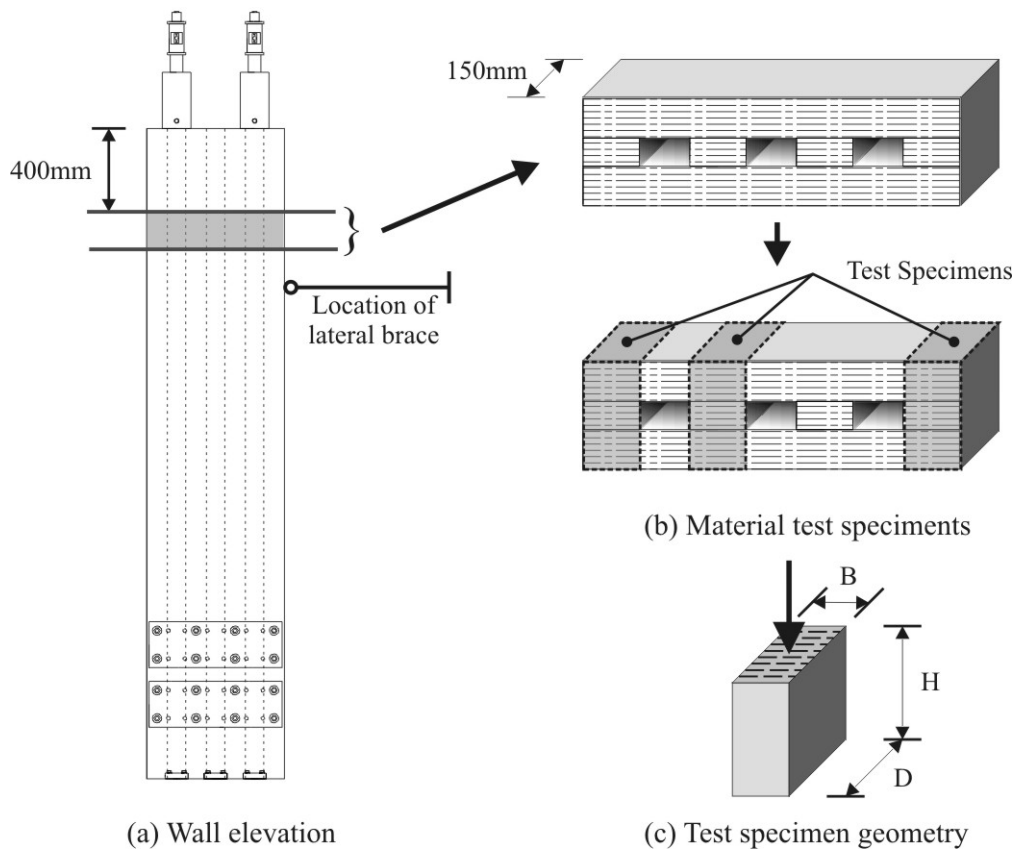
LVL material test specimens used for monotonic compression testing to failure
